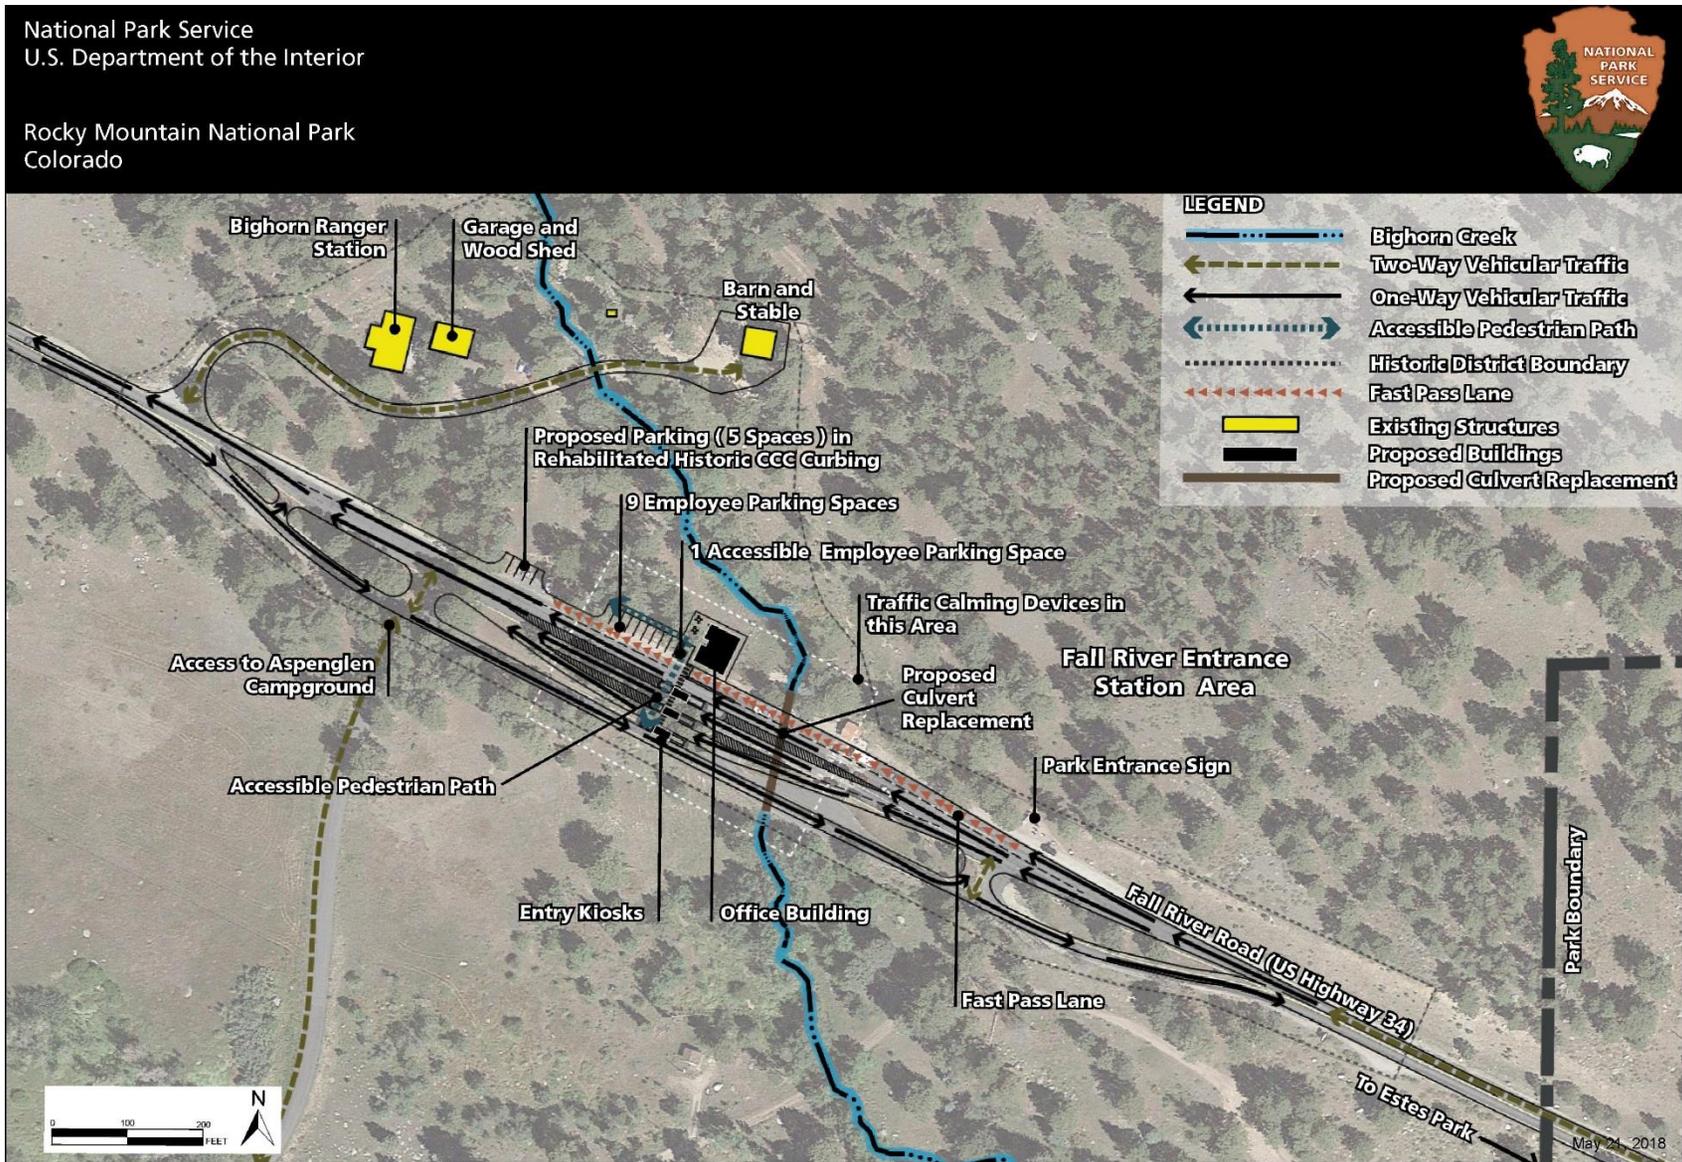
Alternative 4 — Move Fall River Entrance Station Area to the West and Construction New Buildings
